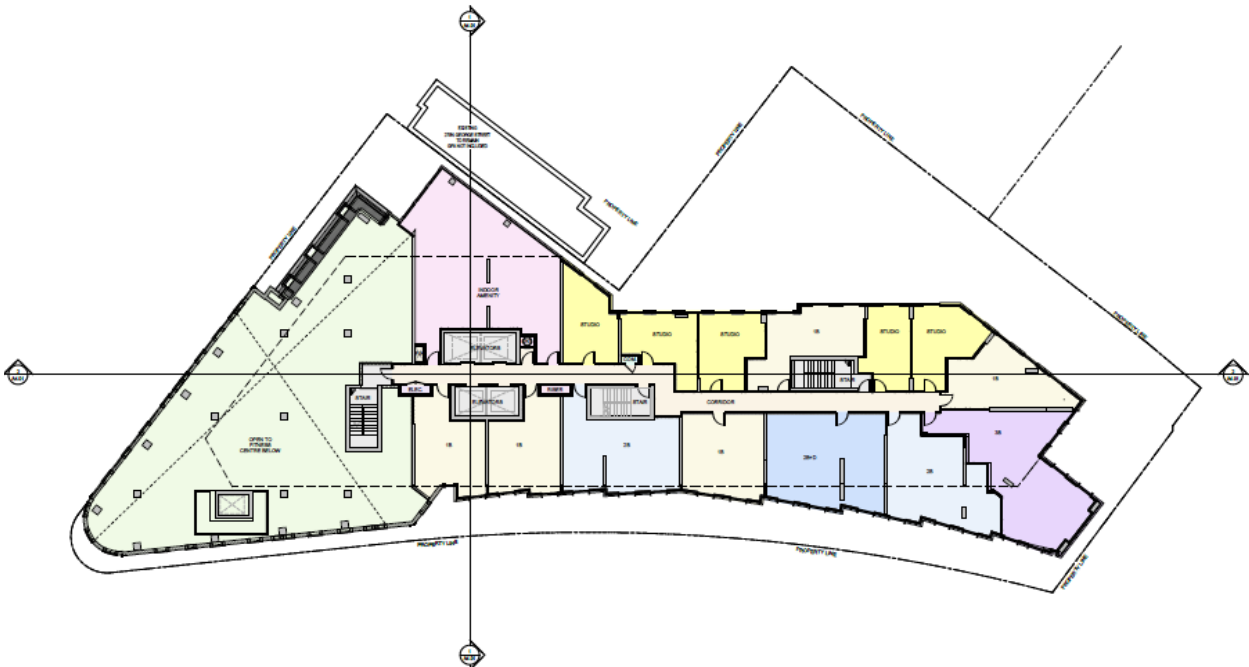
Level 4 floor plan for 212 Dundas Street East included for illustration purposes (Rafael & Bigauskas Architects Inc., February 23, 2026).
